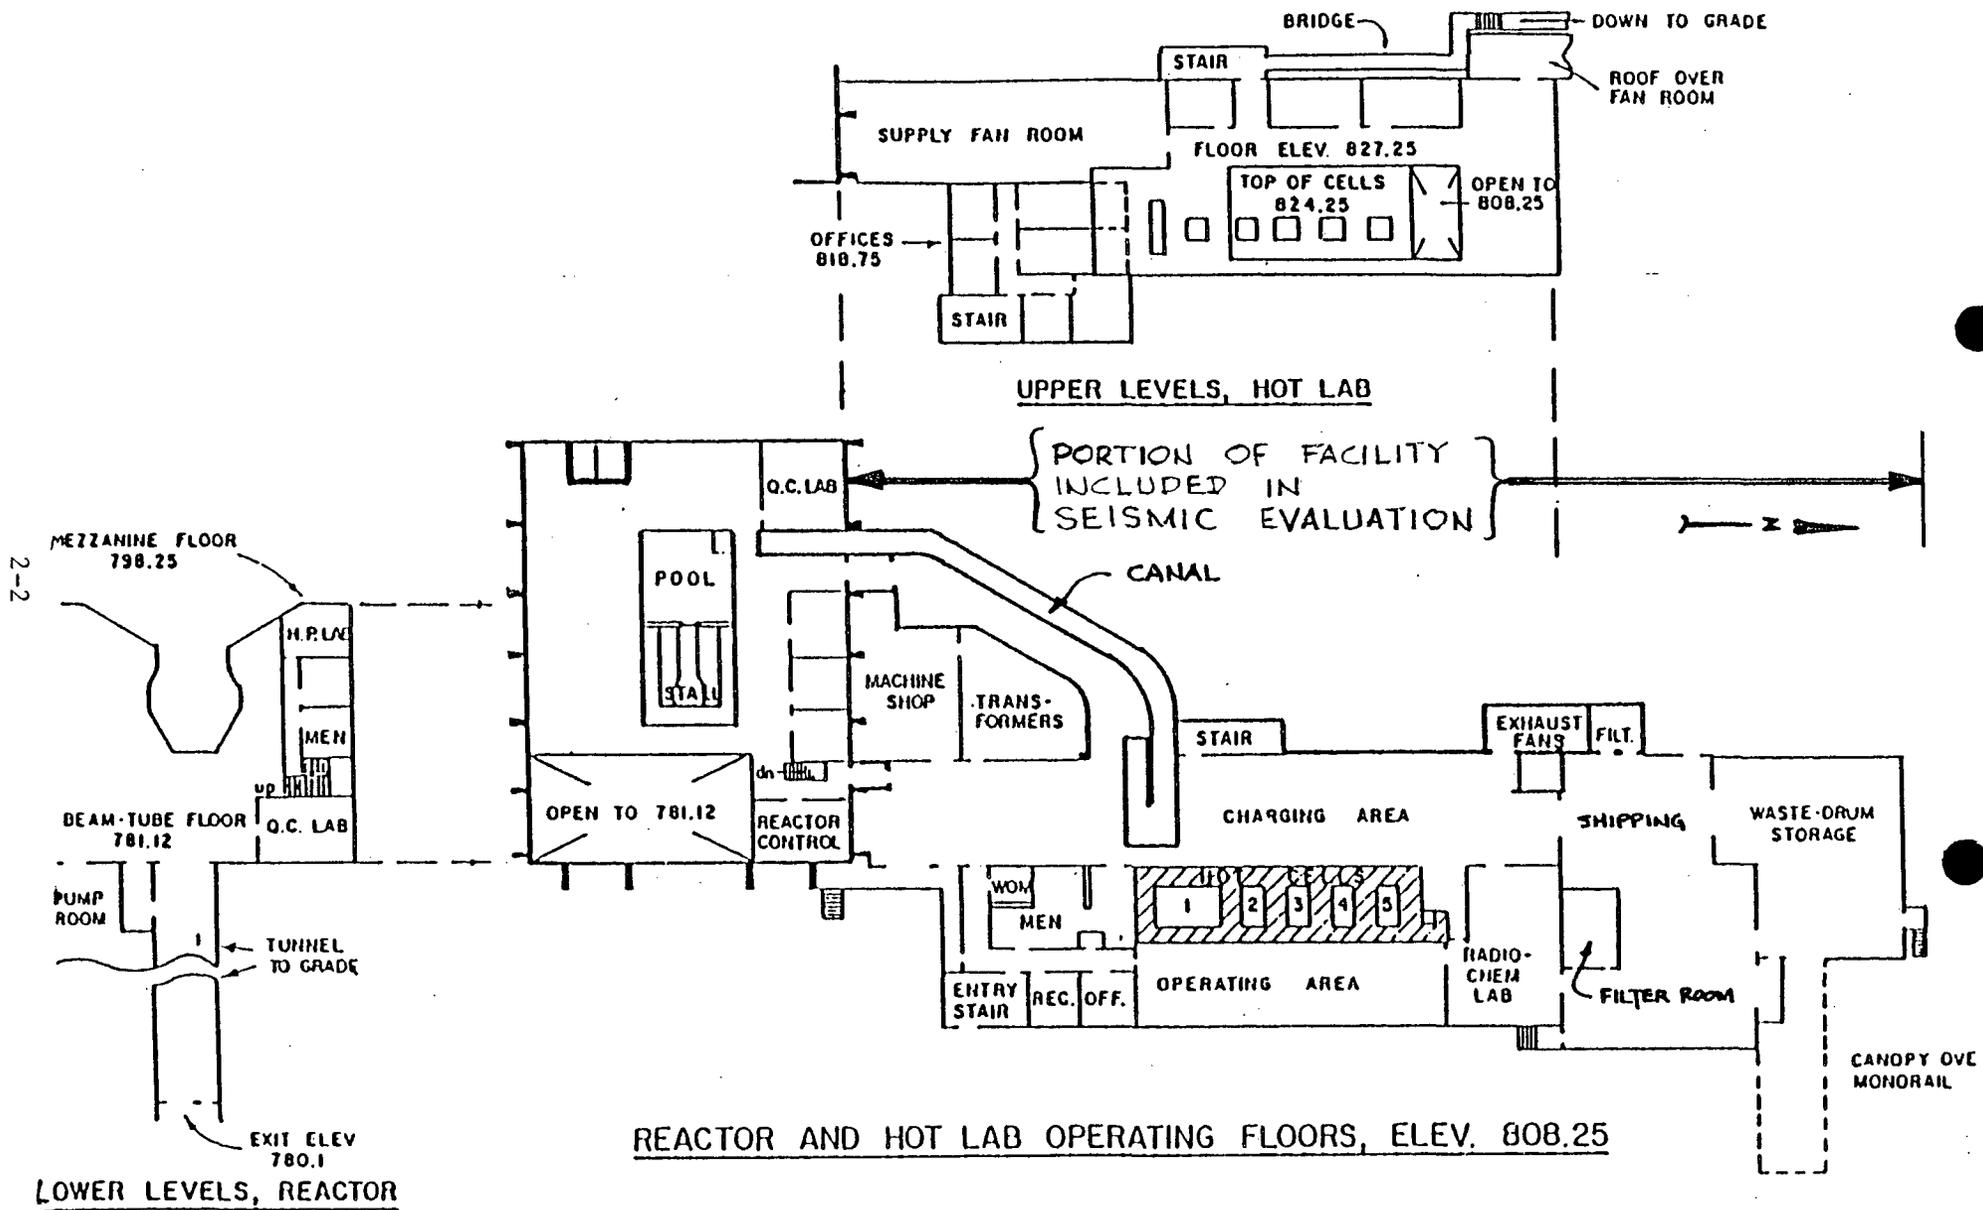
Plan View of Hot Laboratory and Reactor Buildings.
